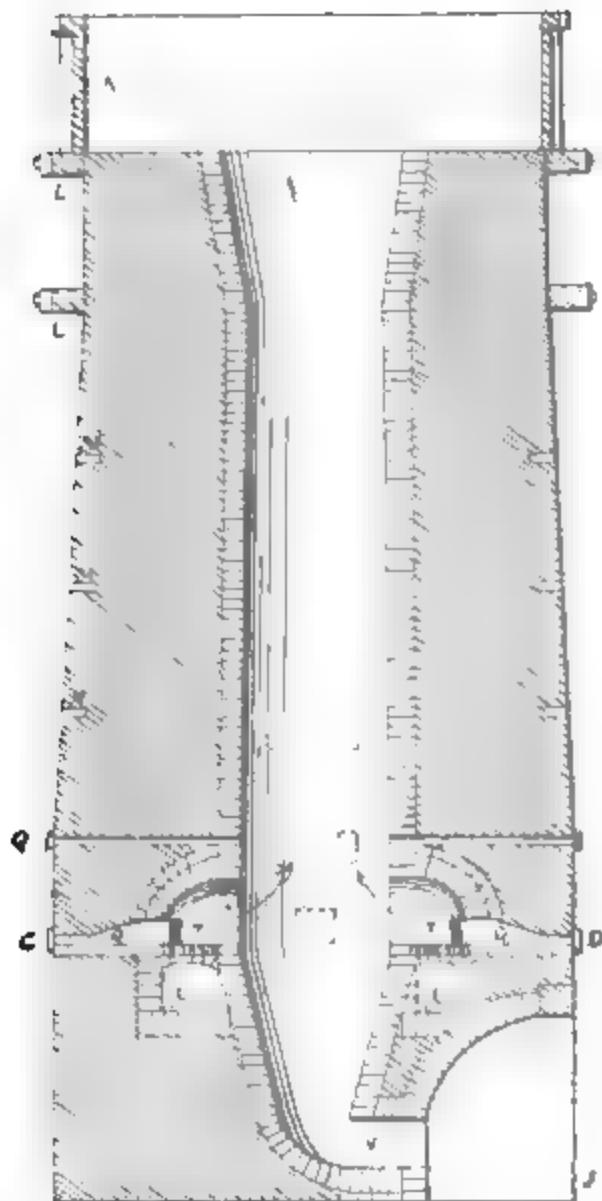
Vertical section of a Page flame kiln with two furnaces constructed for burning wood. (After Gillmore.)
